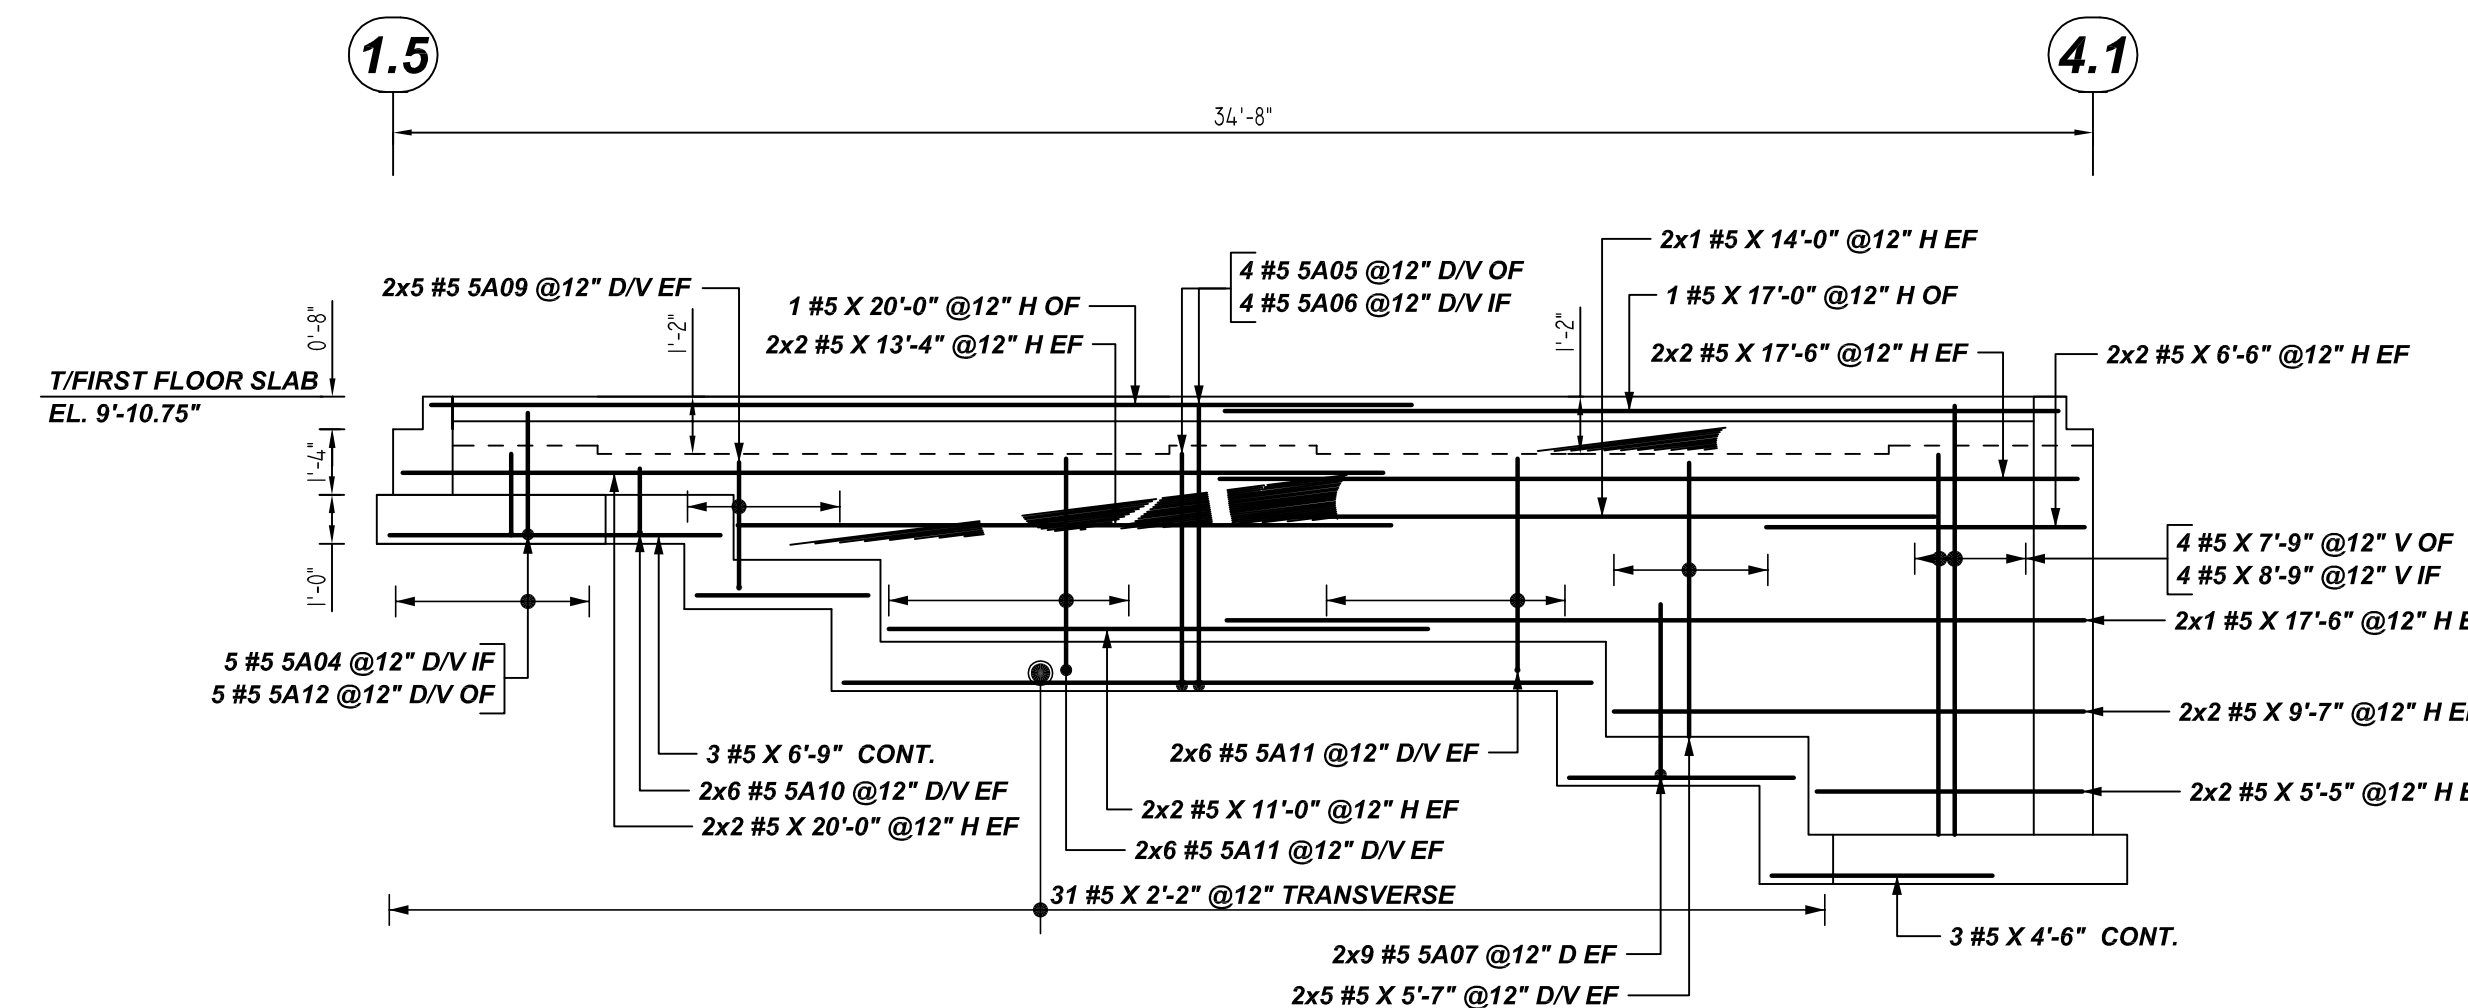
DETAIL-A ELEVATOR REINFORCEMENT DETAILS
